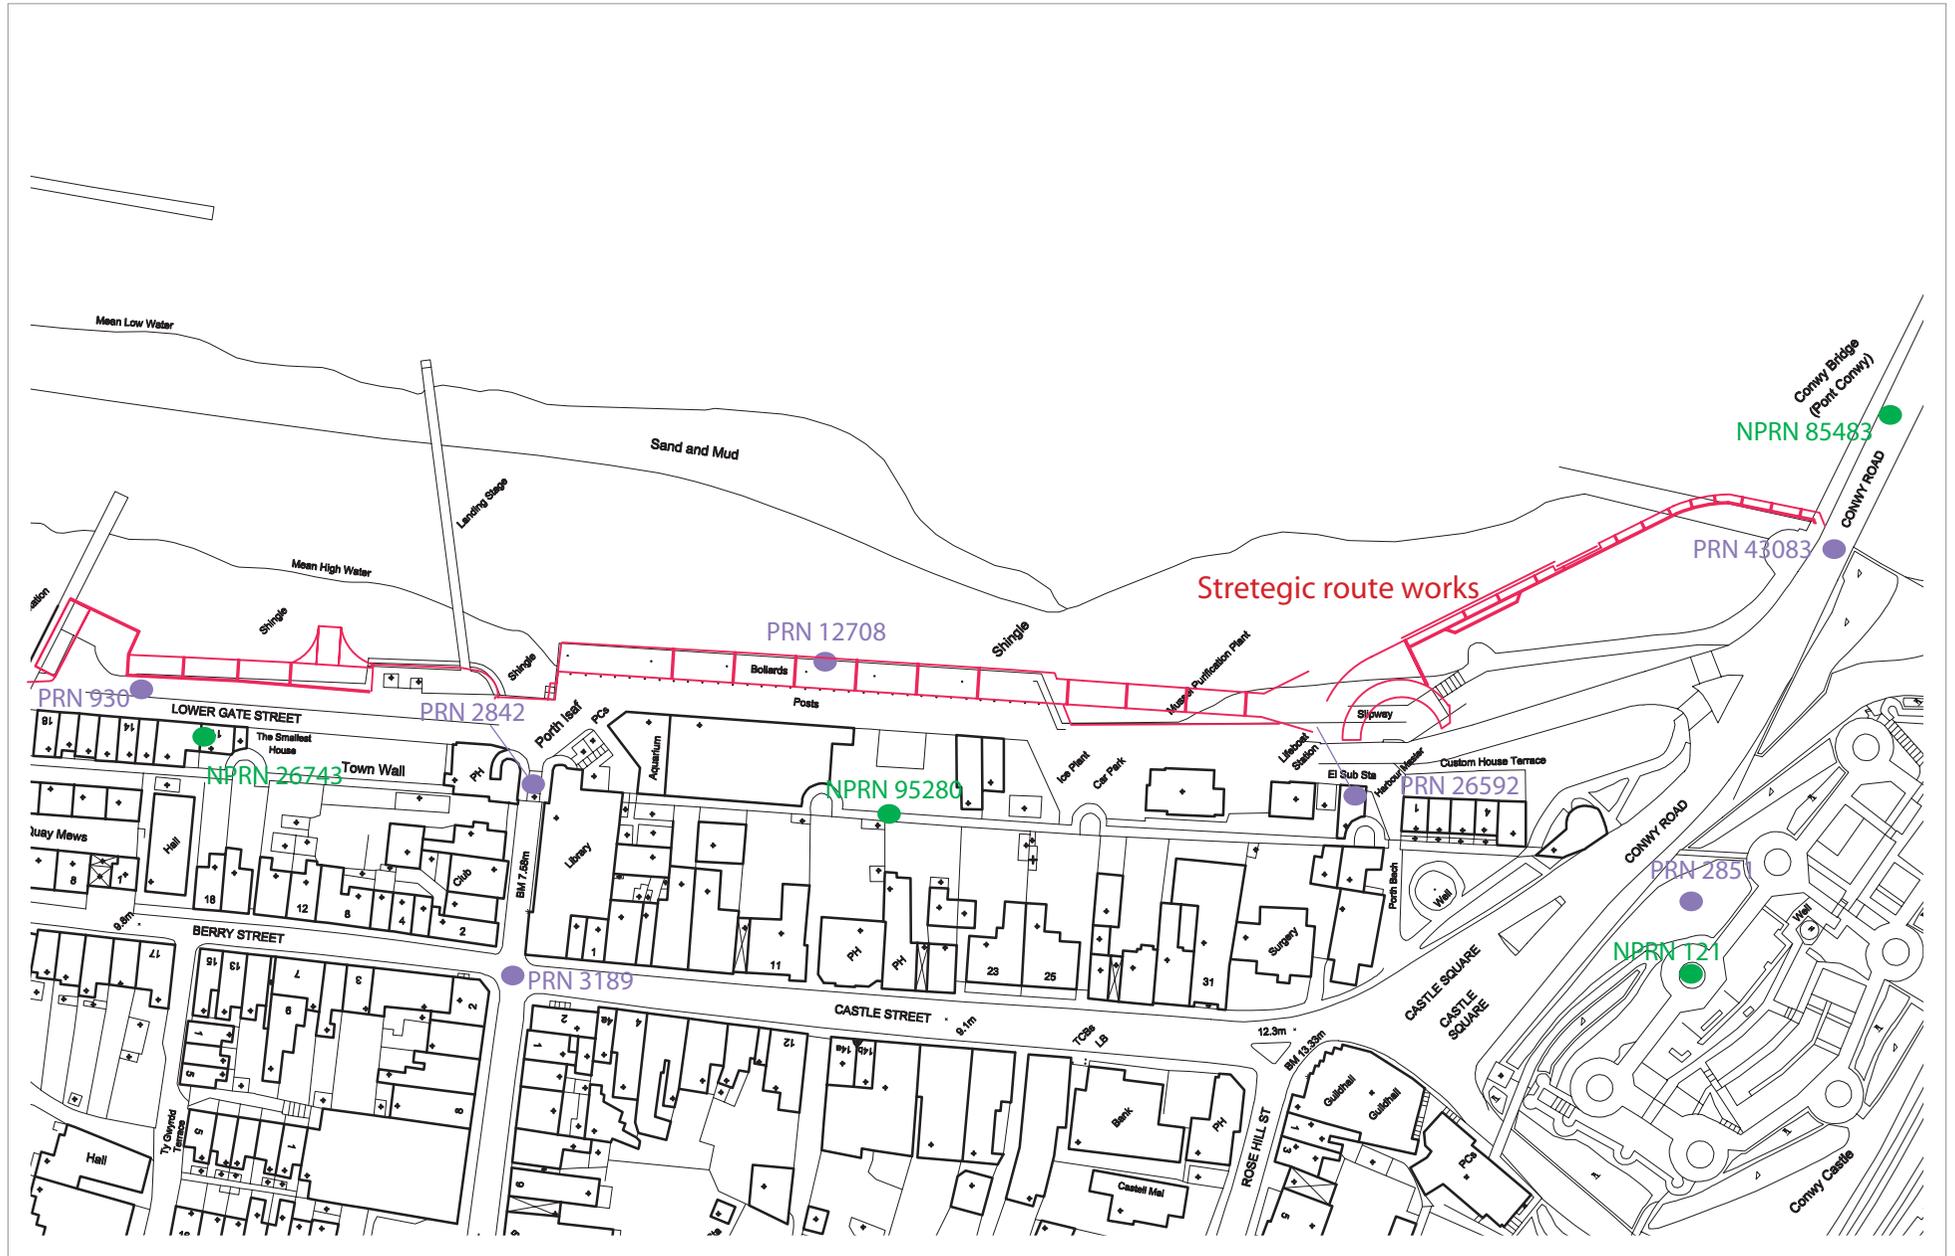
Plan detailing layout and PRN and NPRN sites within the area of Conwy Quay
